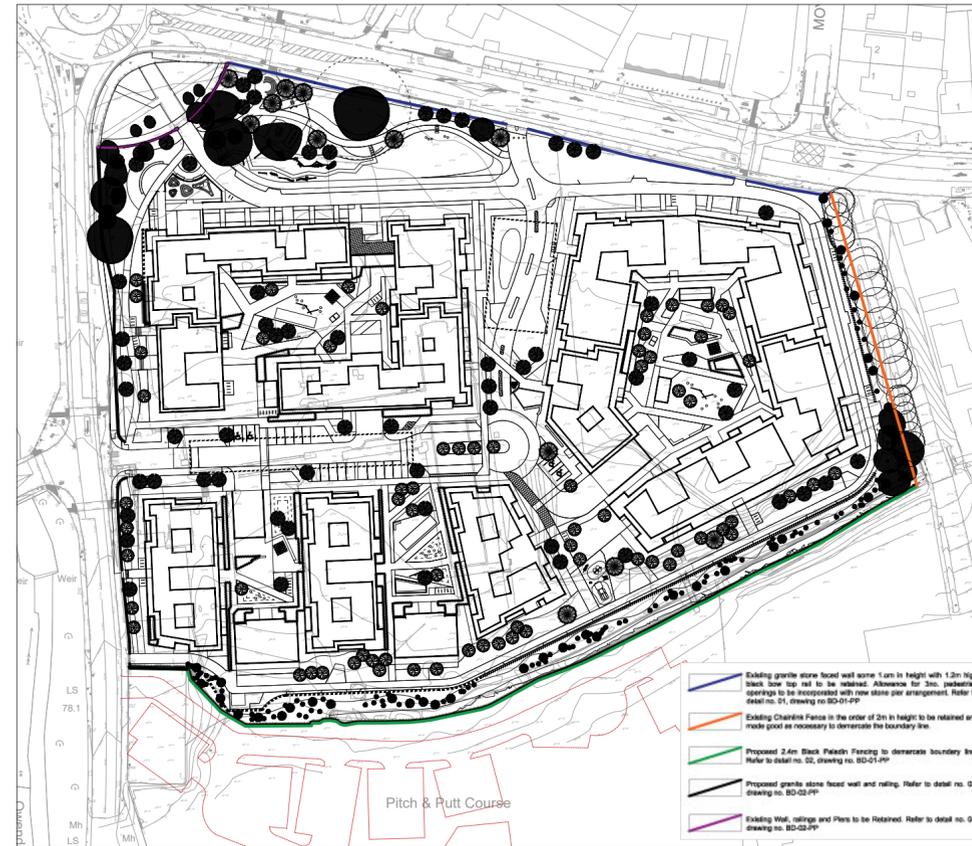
Boundary Plan Details (Extract of Drawing no. BP-01-PP)
